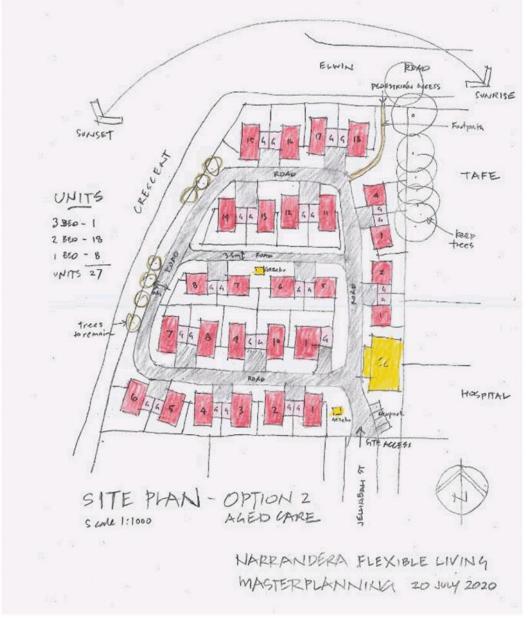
MASTERPLAN DESIGN CONCEPT - OPTION 2
